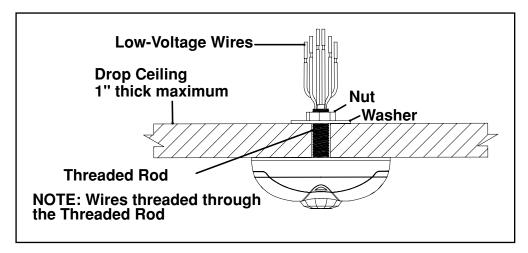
MC-C CEILING MOUNT INSTALLATION
